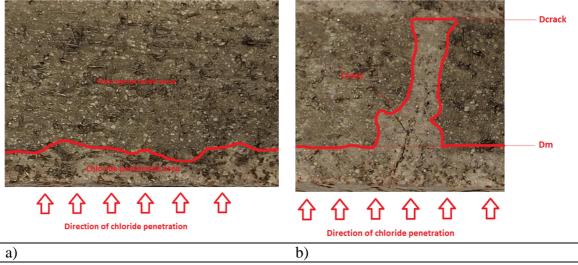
Chloride penetration profiles on: a) Reference specimen and b) cracked specimen.
